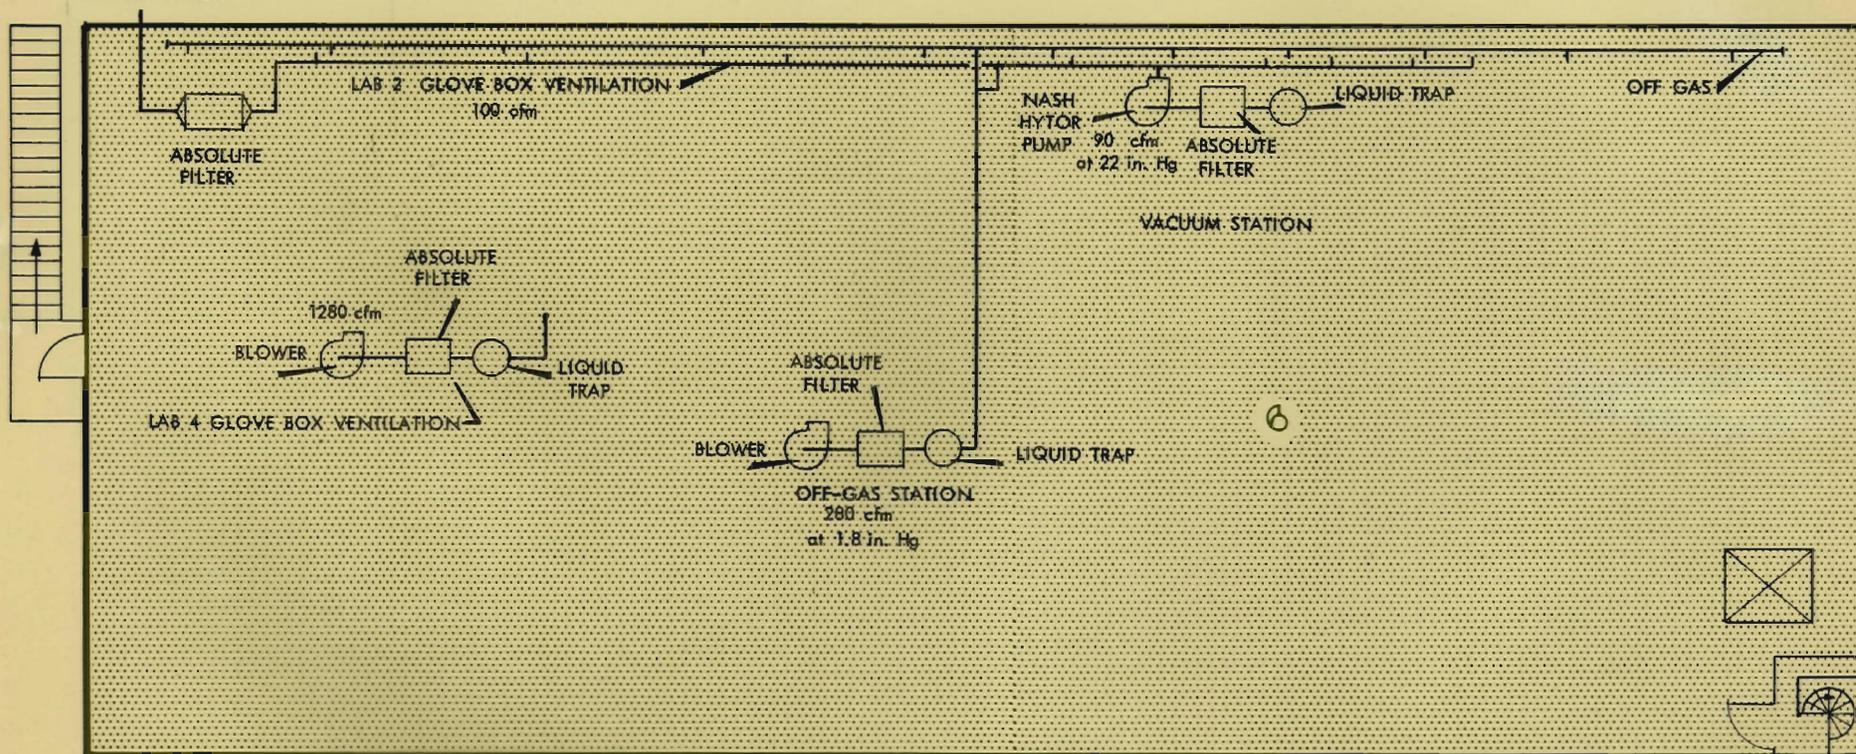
BUILDING 3508 SECOND FLOOR PLAN
